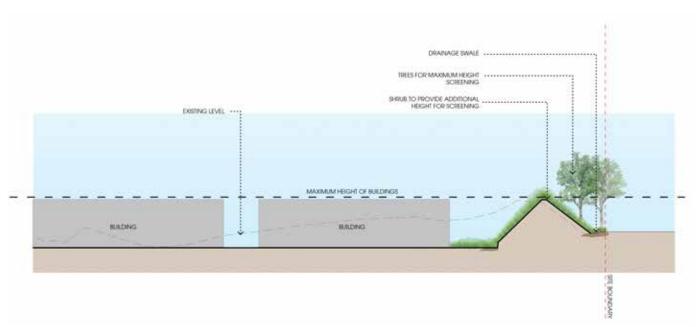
SECTION, THE NEW BUND WITH 10M HIGH BUILDINGS
